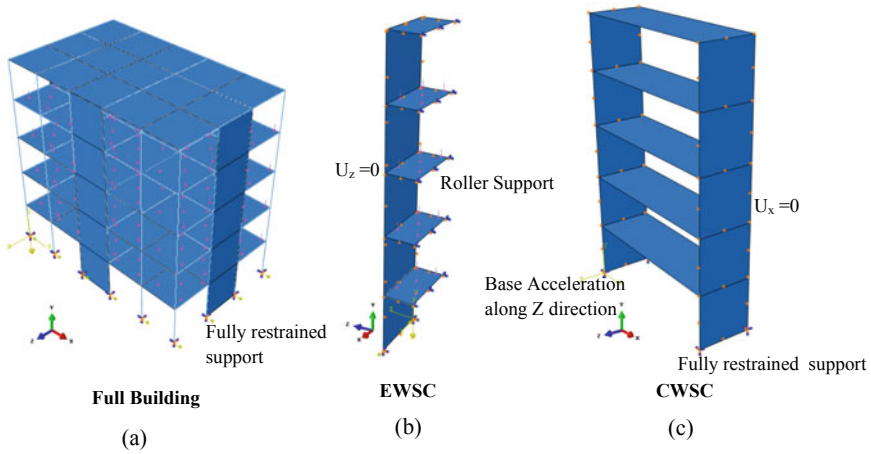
Geometry and boundary conditions: a Full Building, b EWSC and c CWSC
